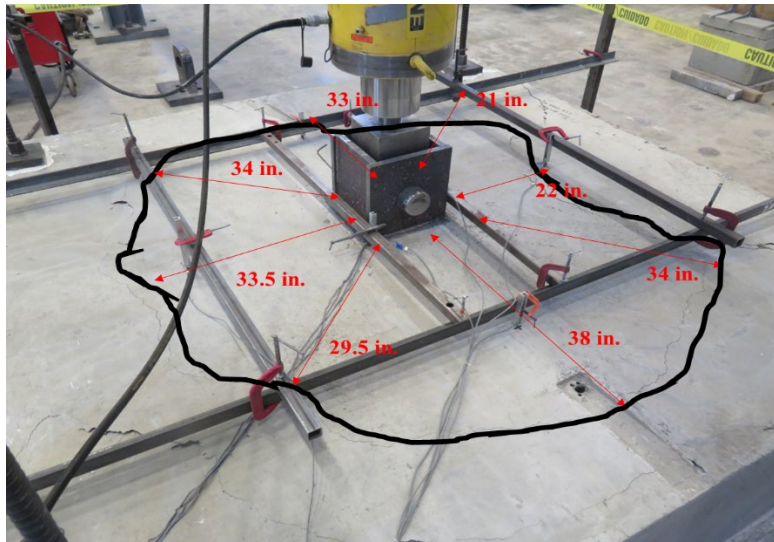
Plan view of cracks and formed on the concrete surface
